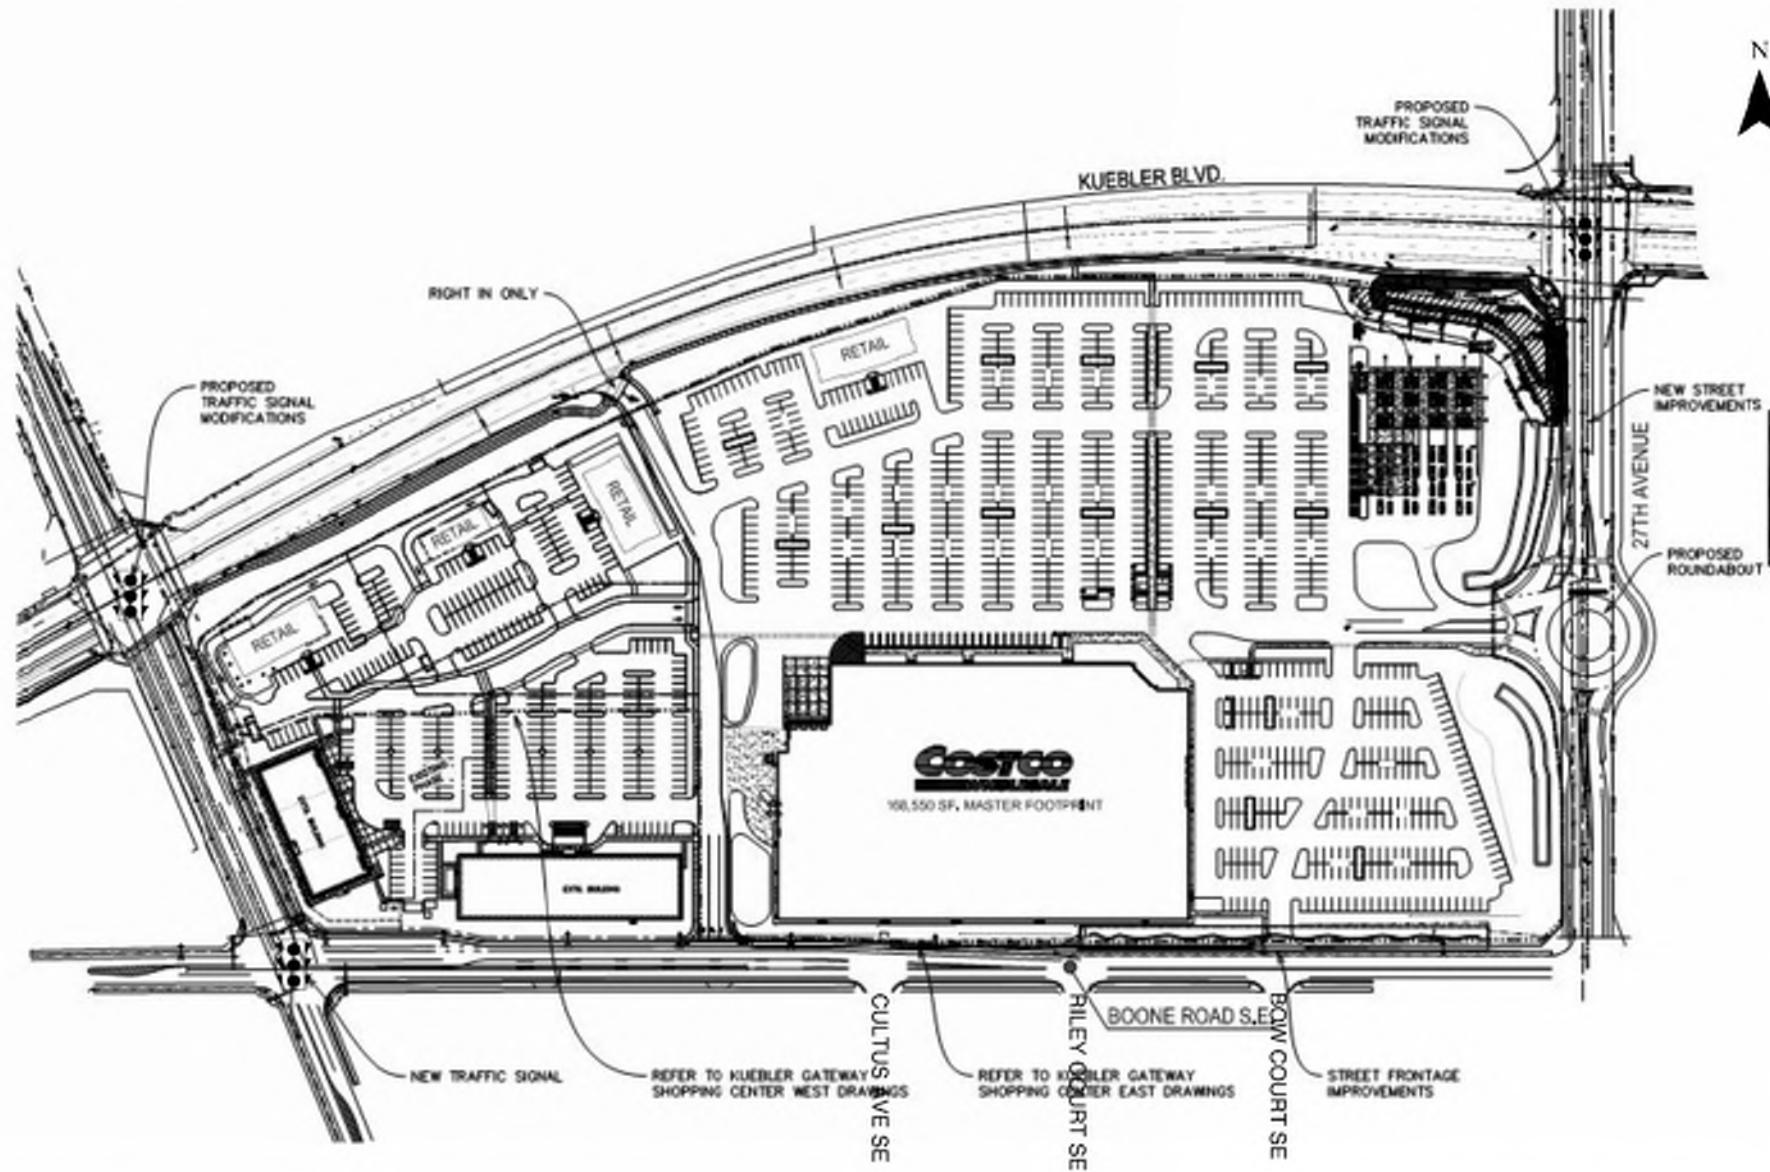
illustrates the preliminary site plan for the proposed Kuebler Gateway Shopping Center. Access to the shopping center is proposed via the following locations:
